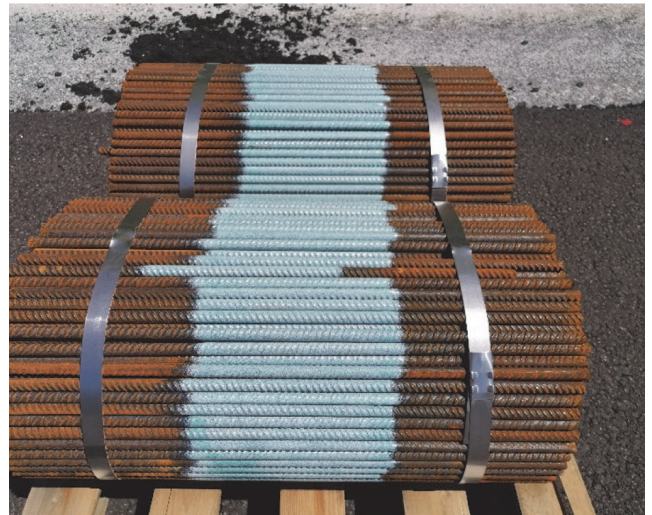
Anchors for longitudinal dummy joints [Author 2023]
